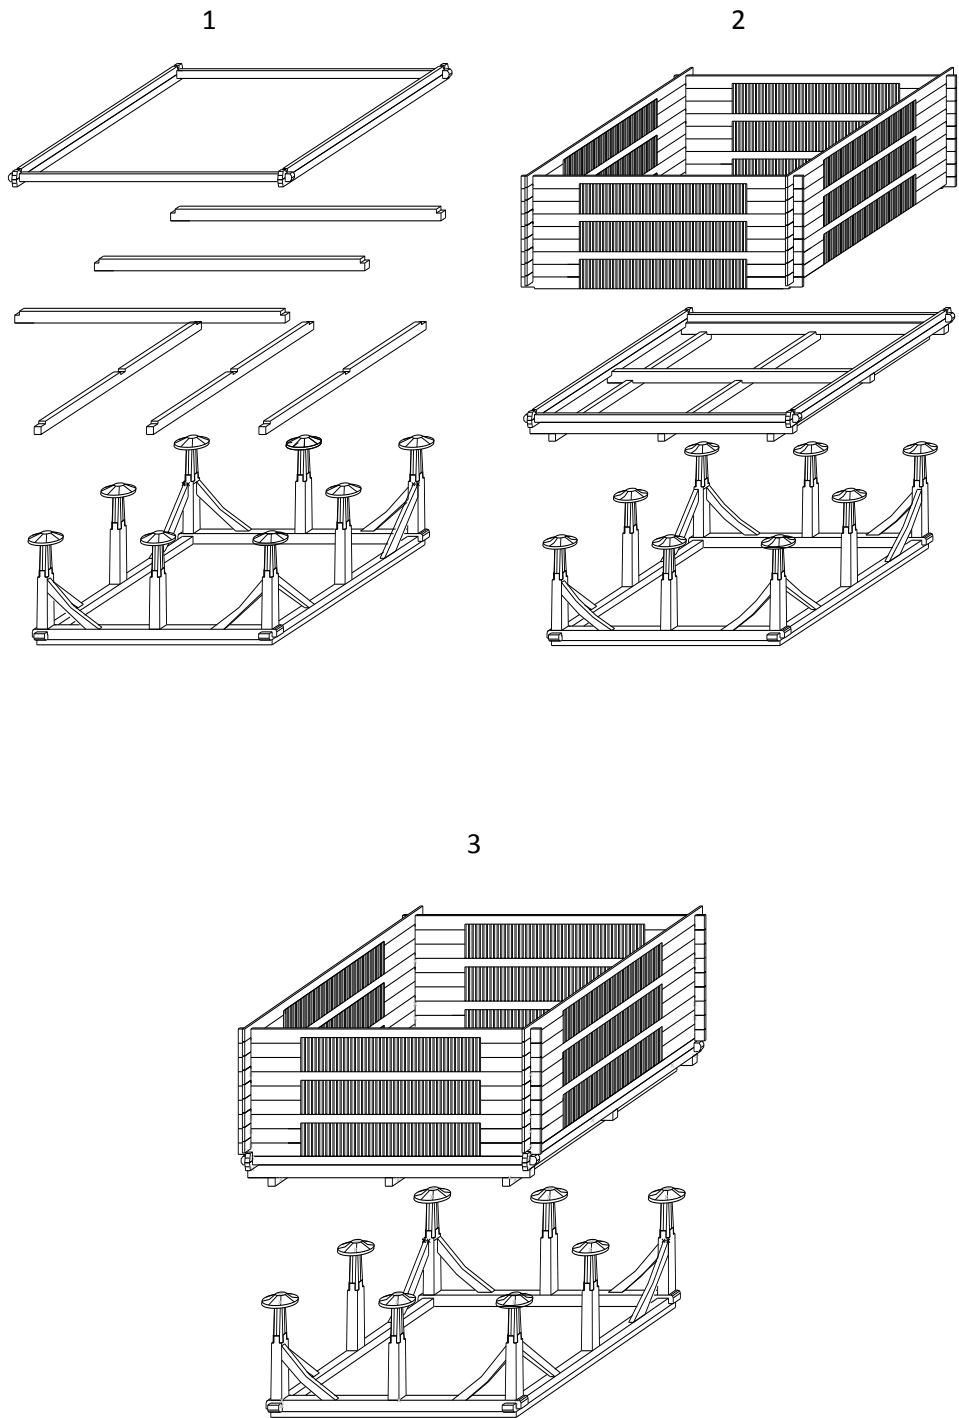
Construction detail of composite carpentry system set in timber post and lintel
